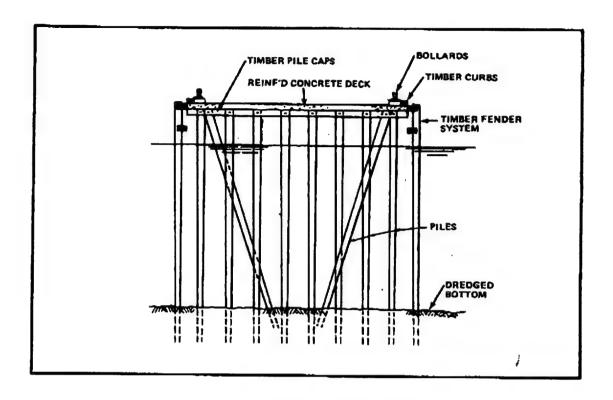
Single-deck, Open Pier. (463-2 990; 3-3)
